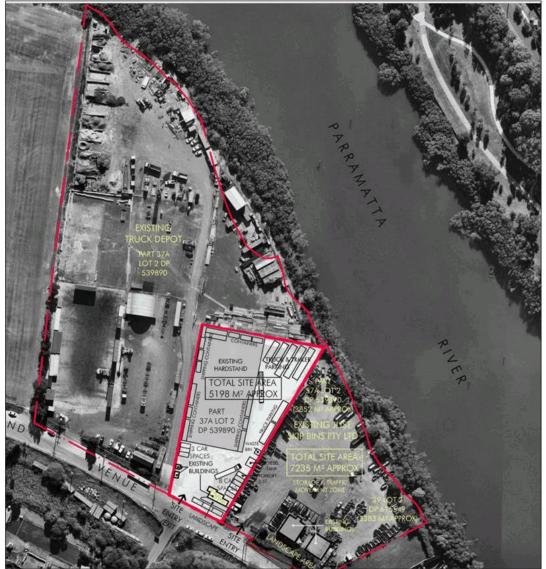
Site Plan showing section of the Site operated by Streamline Container Services (Source: Nettletontribe, 2021)
